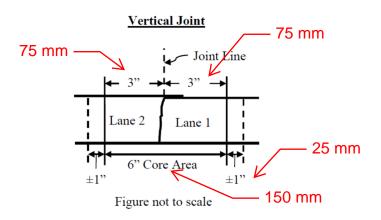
Cross-sectional View, Position of Core Along Longitudinal Joint
